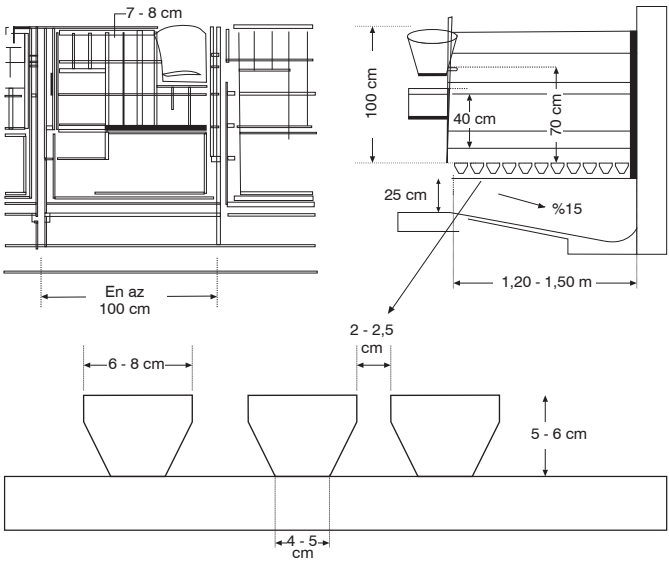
Grid-Floor Calf Boxes and Grid Details
